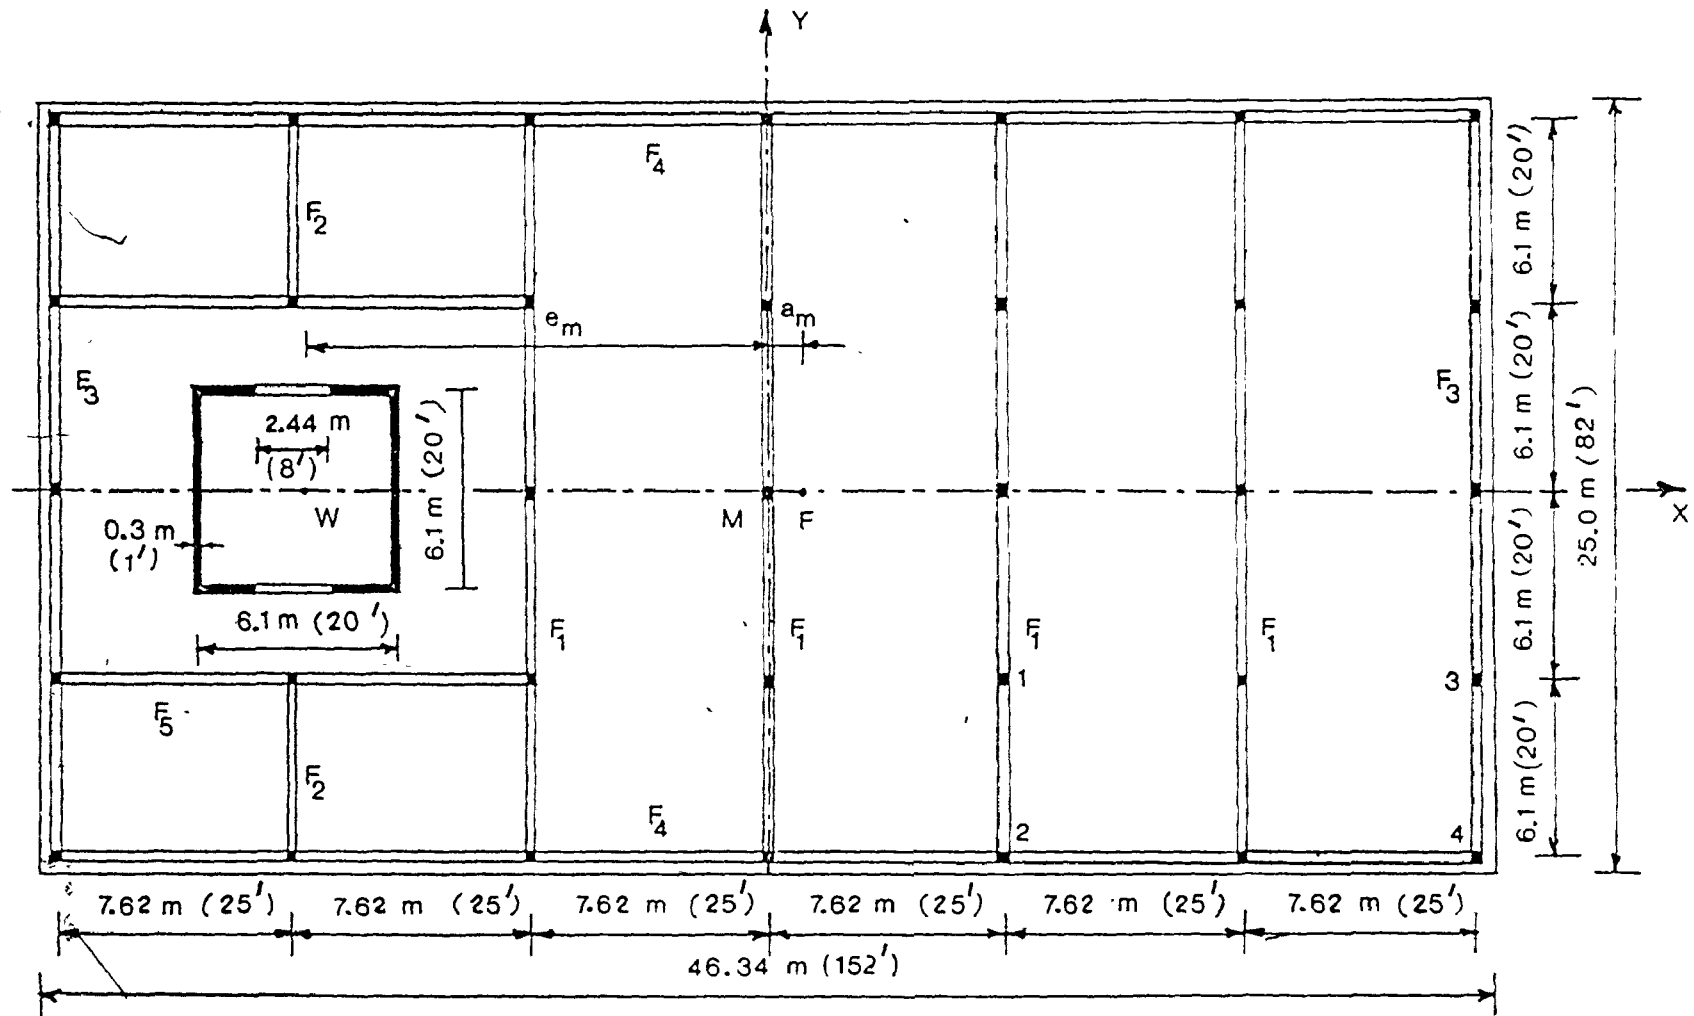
FLOOR PLAN FOR EXAMPLE STRUCTURE II
